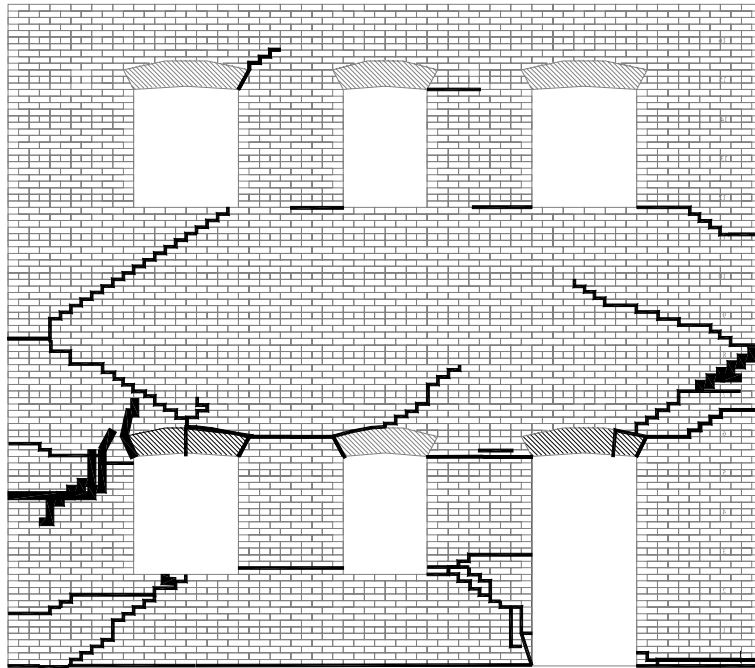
Crack pattern of Wall A following the Group 2 cycles.
